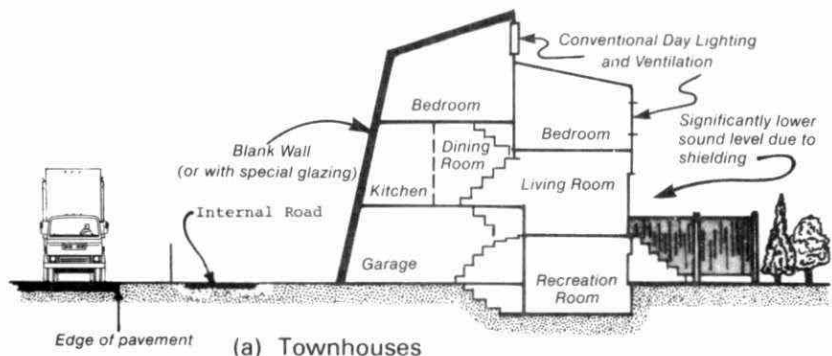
The Use of Blank Walls in Barrier Buildings or Blocks
